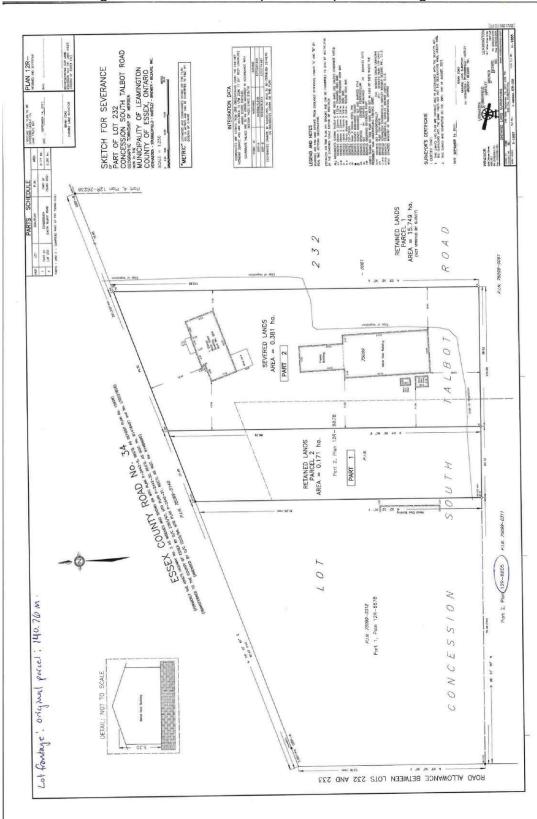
Site Plan - Proposed Surplus Dwelling Lot
